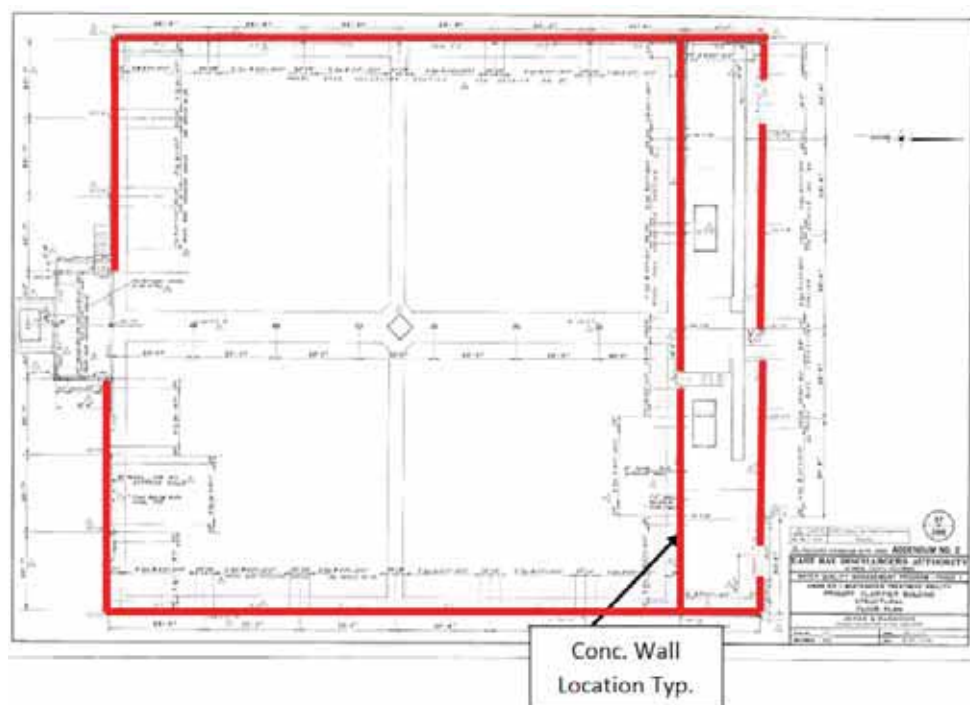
Primary Clarifiers 1-4 Precast Concrete Wall Locations
